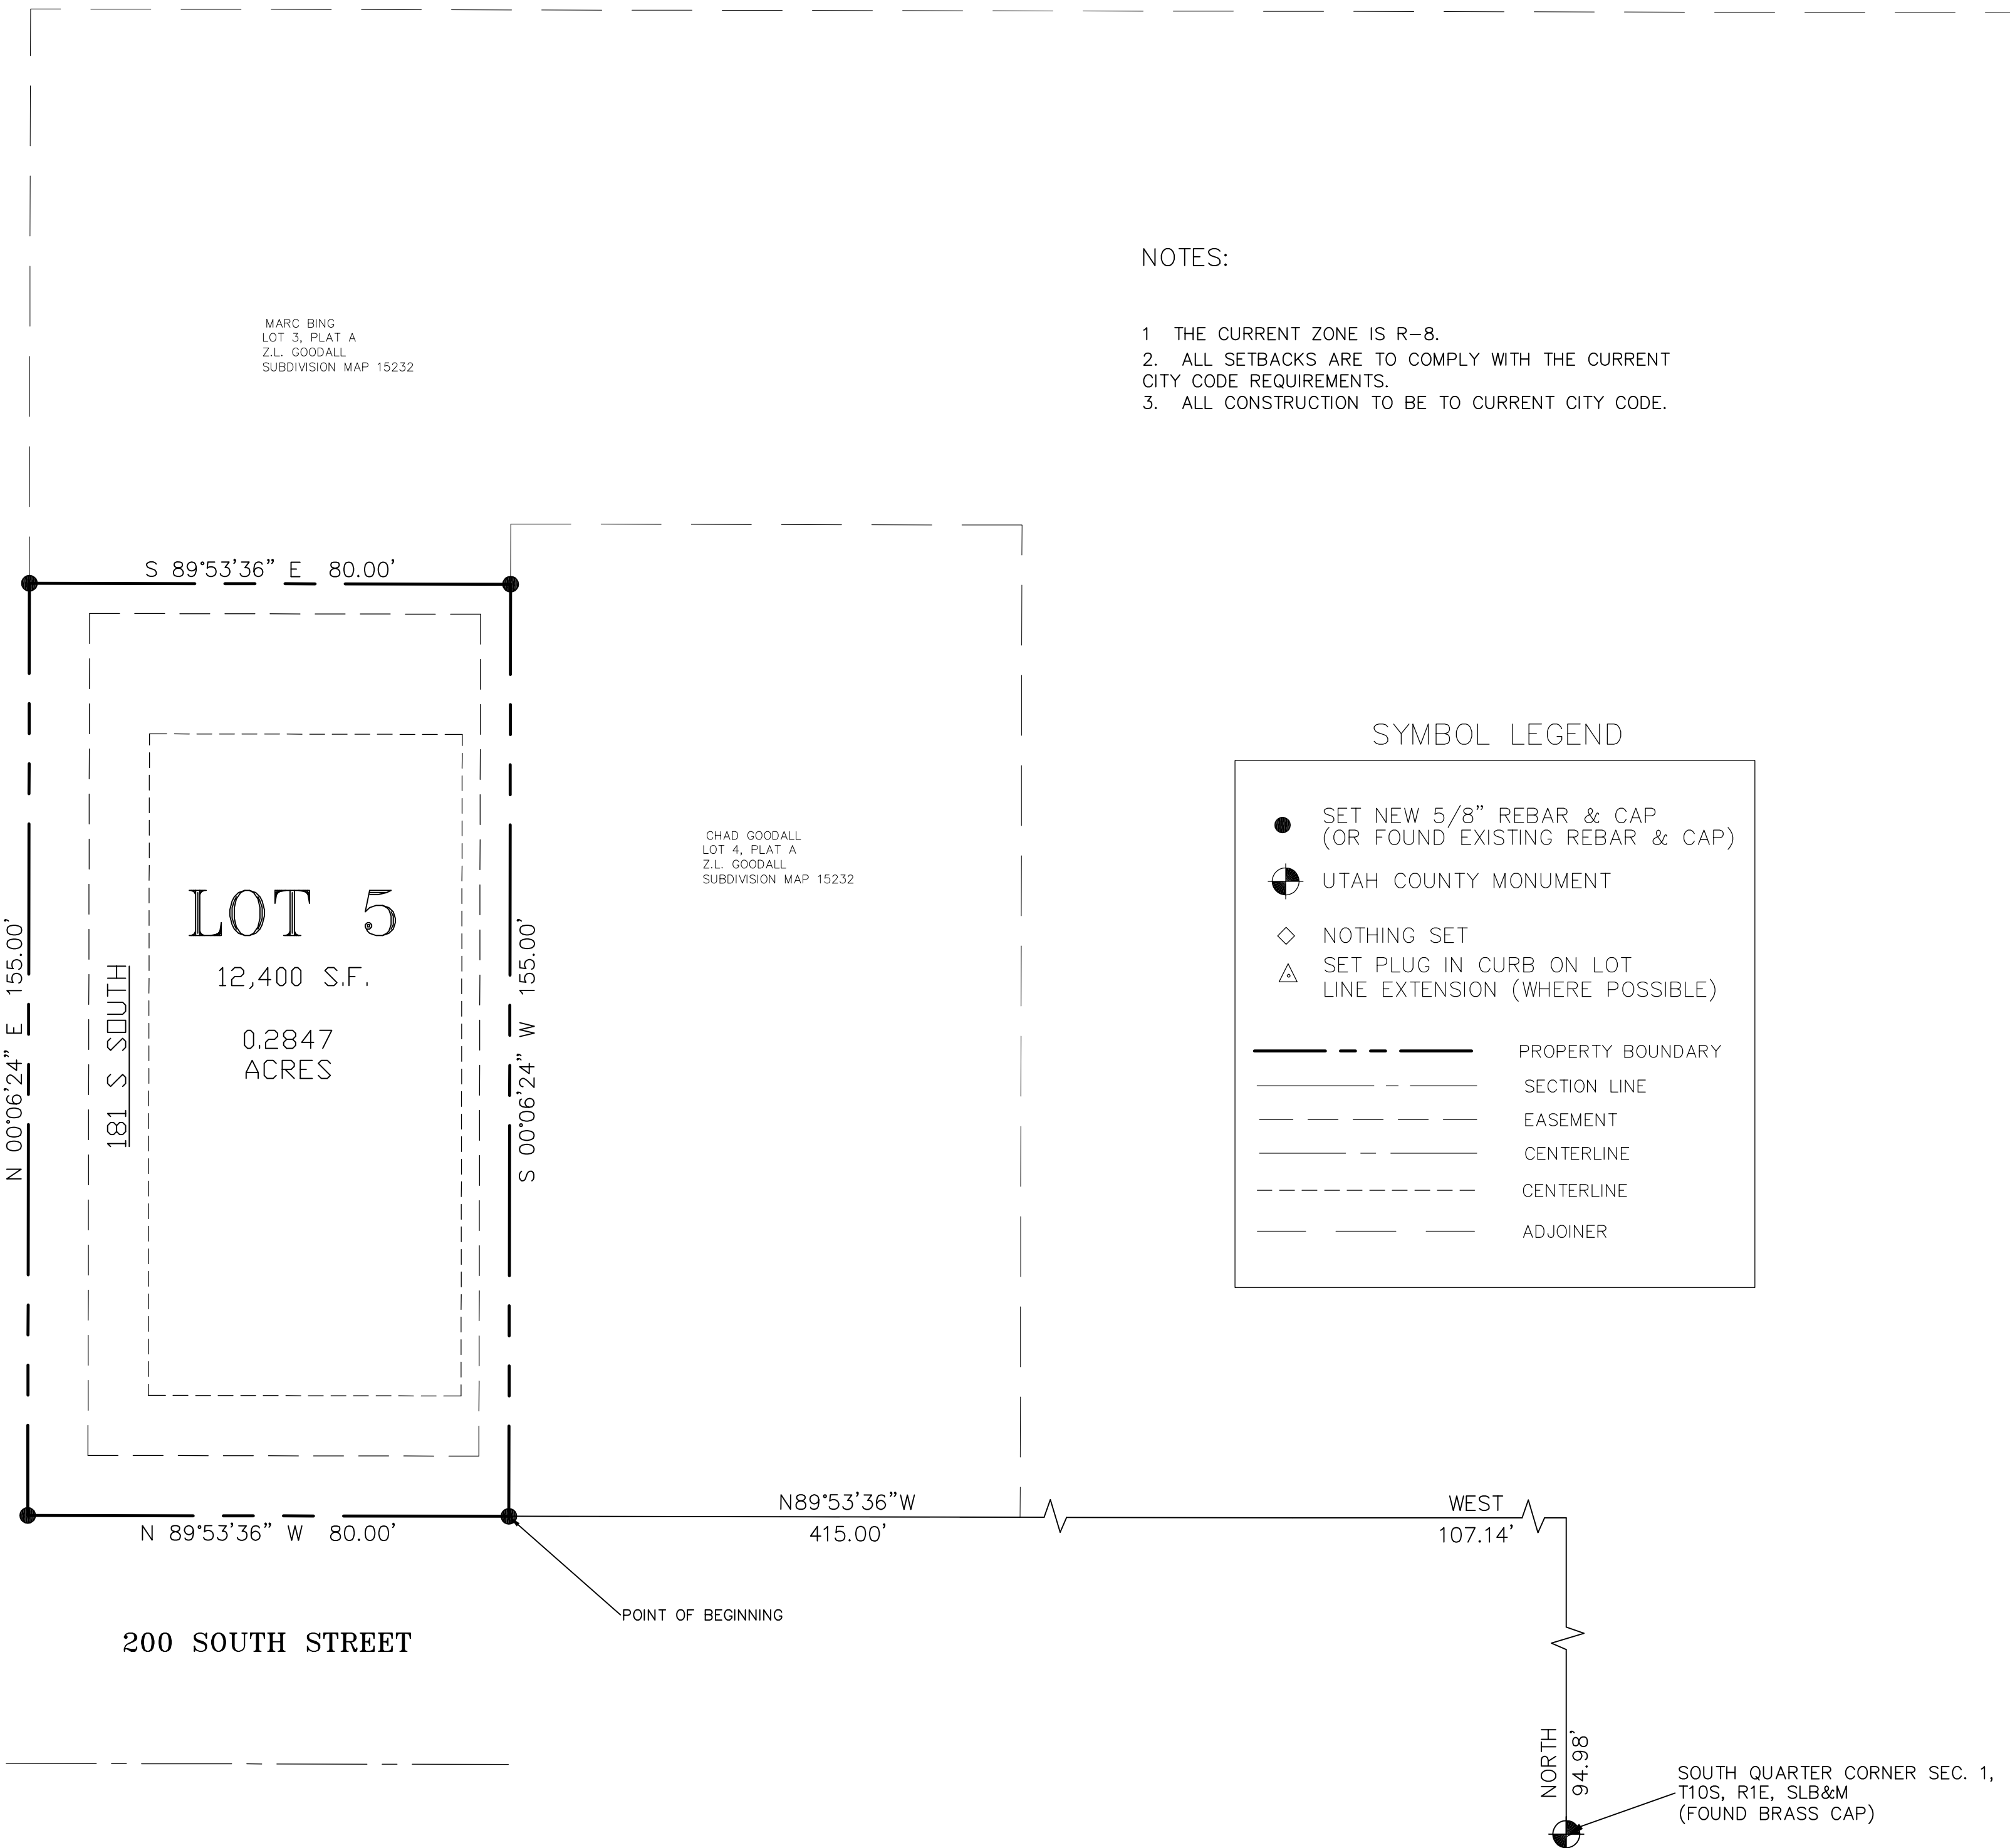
DETAIL-TYP. BUILDING SETBACK & EASEMENT
